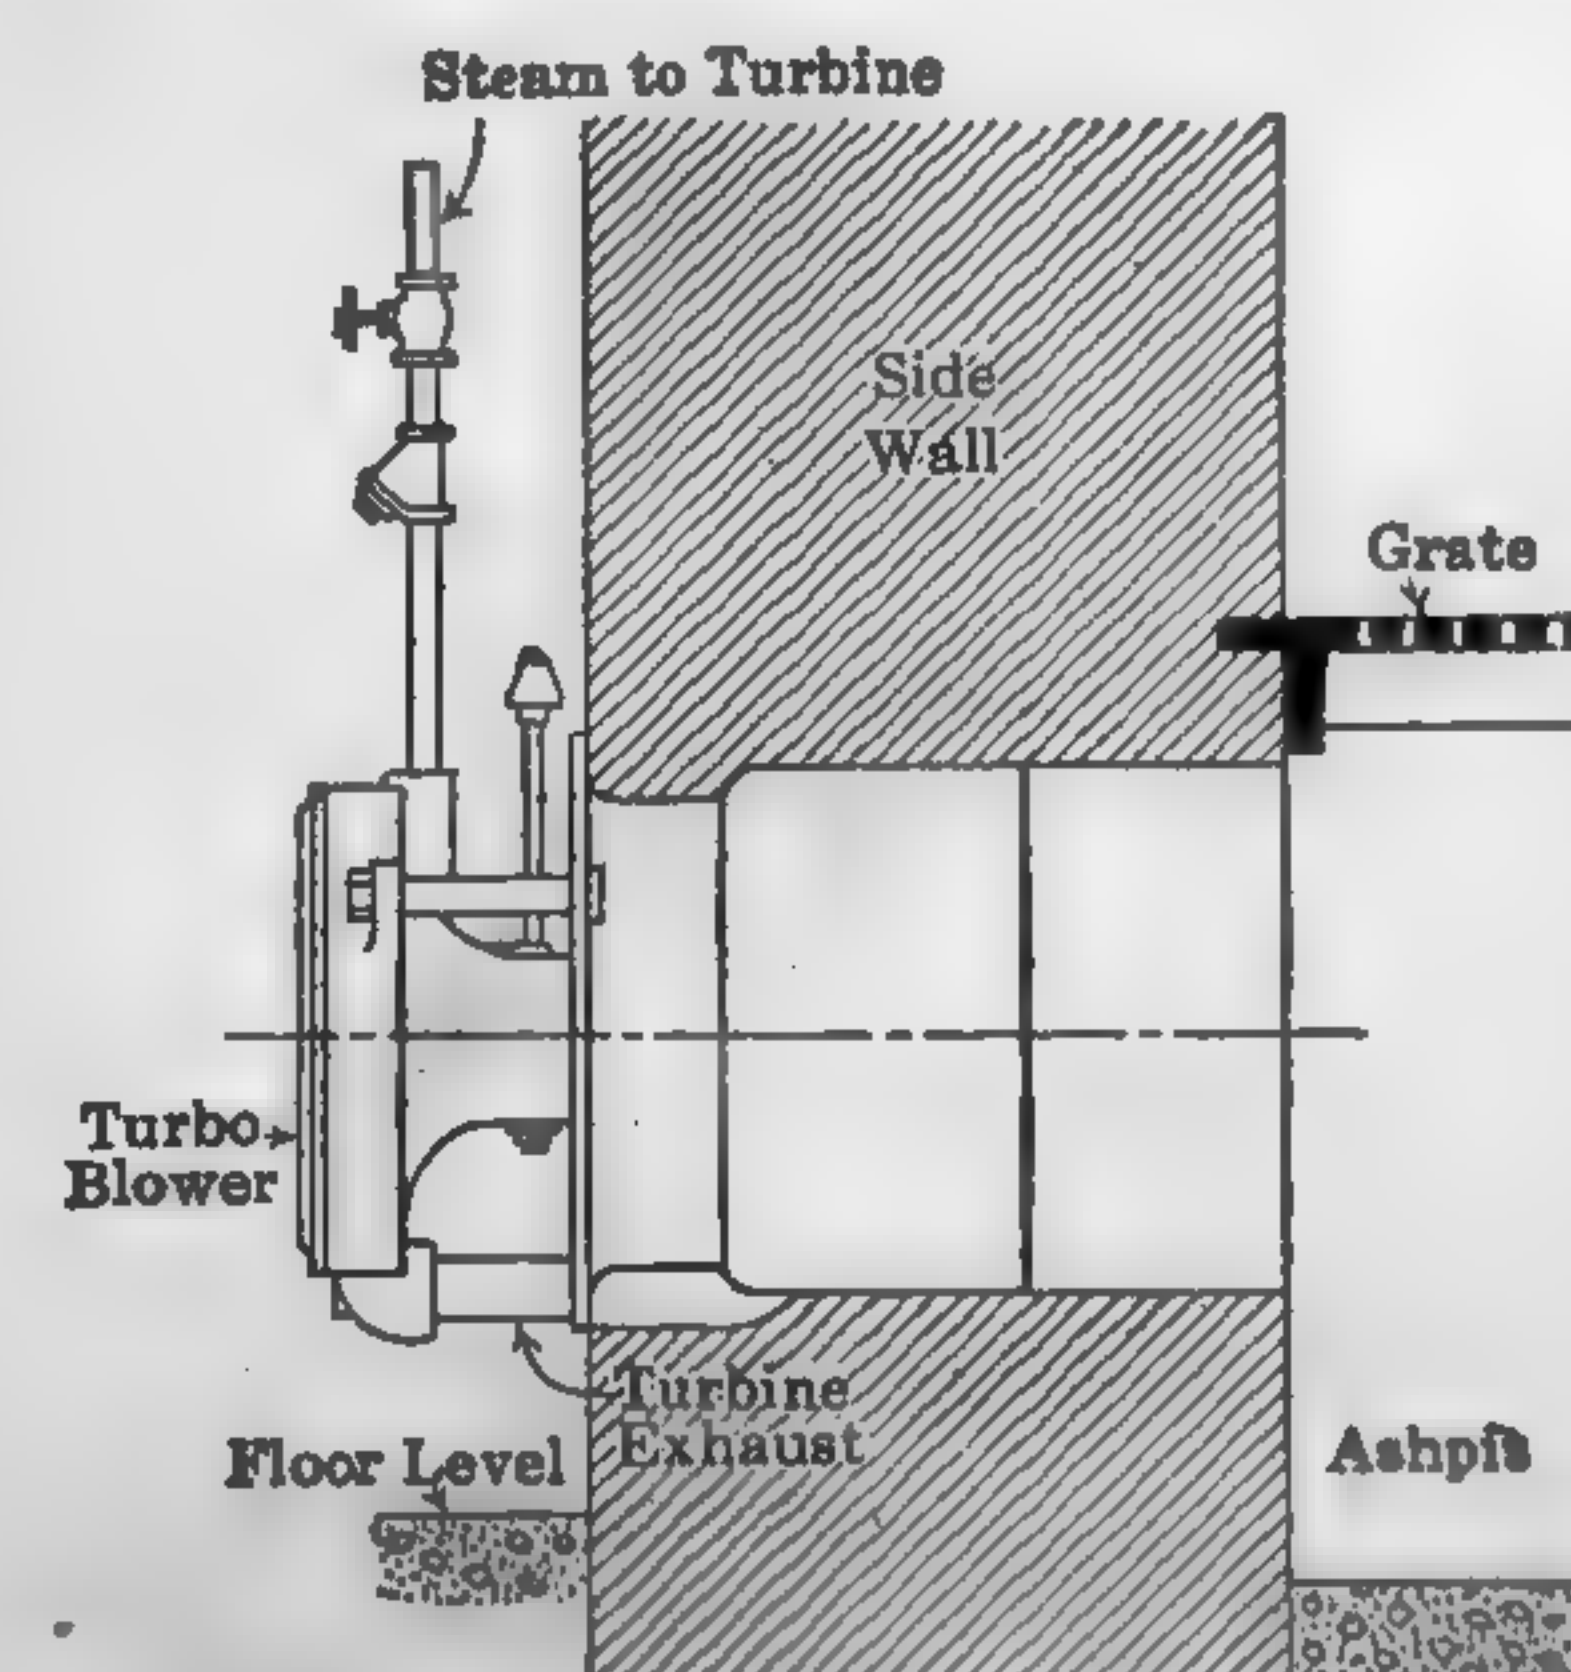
Typical Forced-draft Equipment. Hand-fired Boiler.
